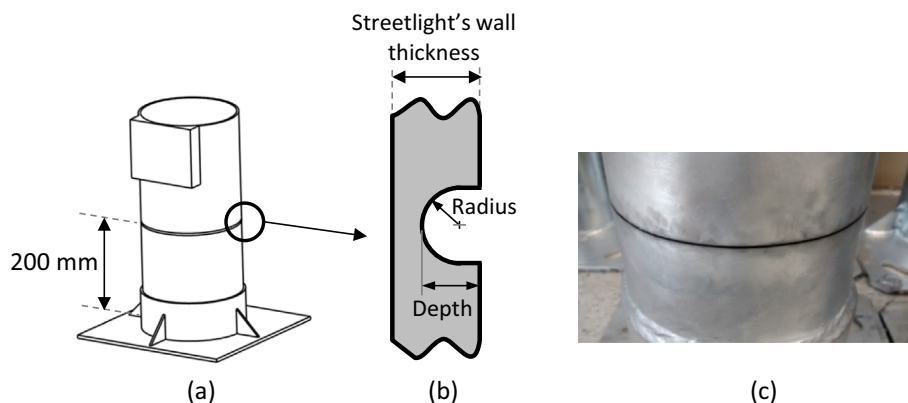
Detail of the notch (a) notch section detail view, (b) detail of hollow streetlight's wall, and (c) picture of a real notch machined at the streetlight base.
